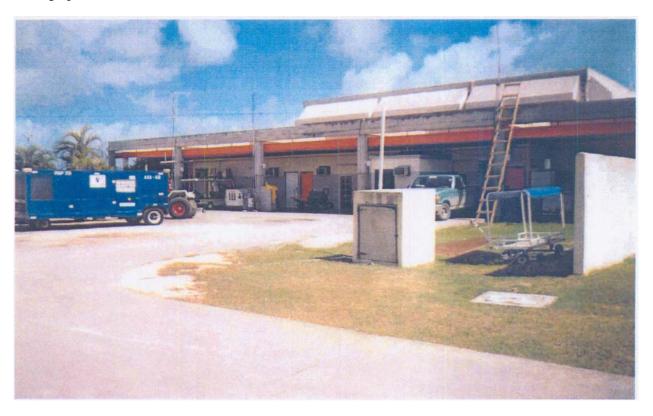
Power Station fuel pipeline and ShelllDelta access road
